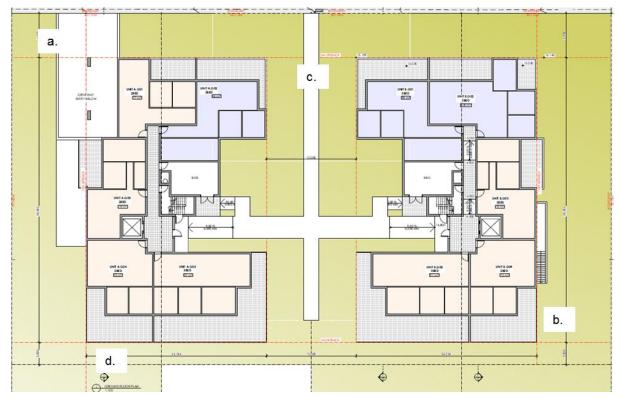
Setbacks up to 4-storeys for developable site area, see p.12 Attachment 2 (Source: PTI Architecture)
